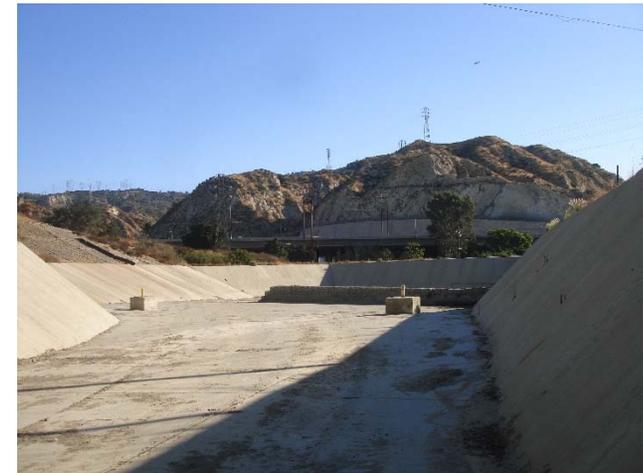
Access Road Prior Slope Wet Area near Terminal Basin: September 12, 2017
